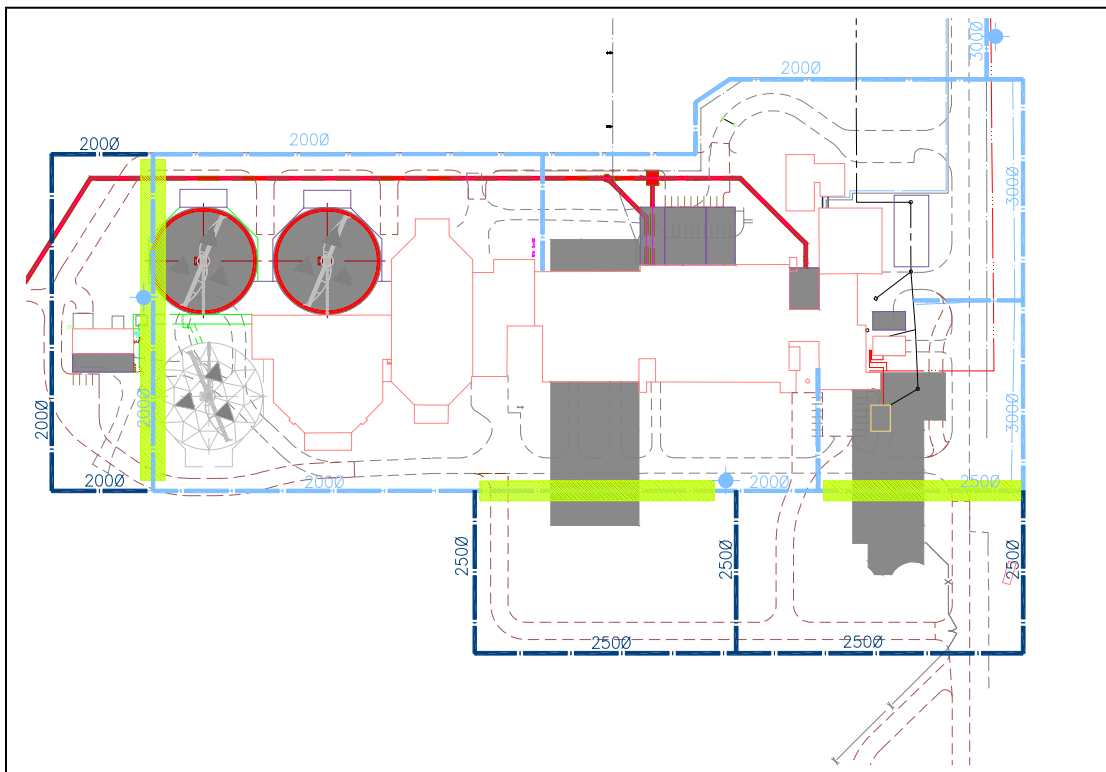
Revisions to "On-Site Proposed Watermain"
